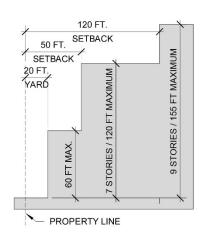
SECTION AT ROCKINGHAM STREET EAST
